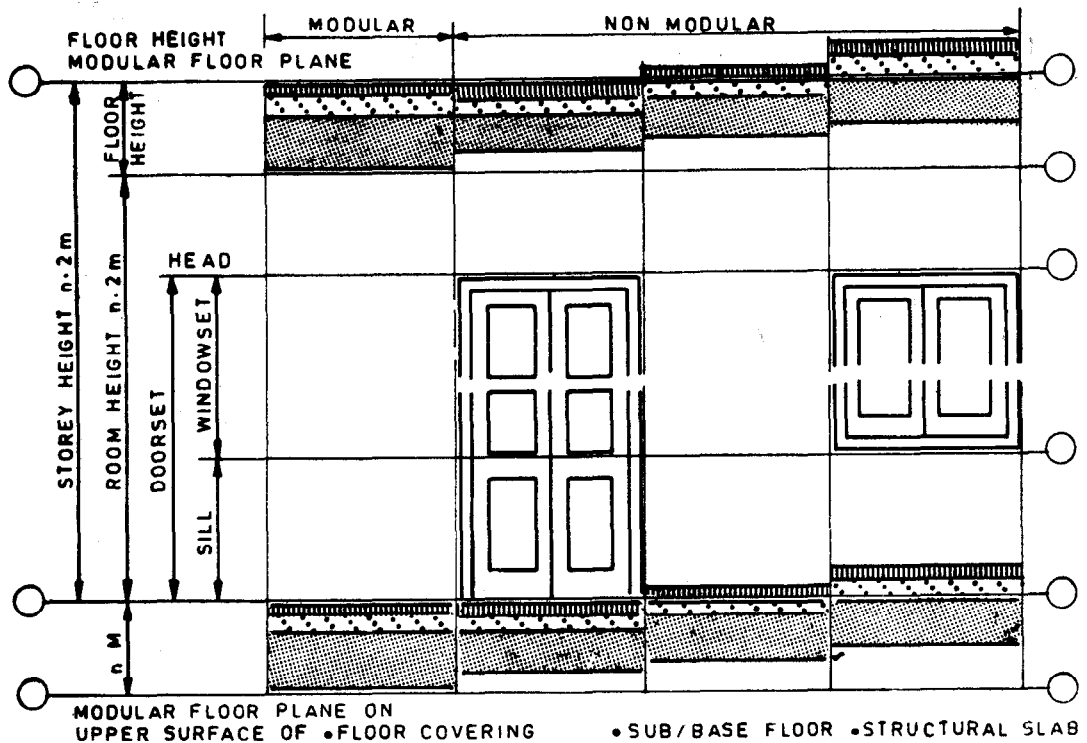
LOCATIONS OF STRUCTURE FLOOR SLABS
